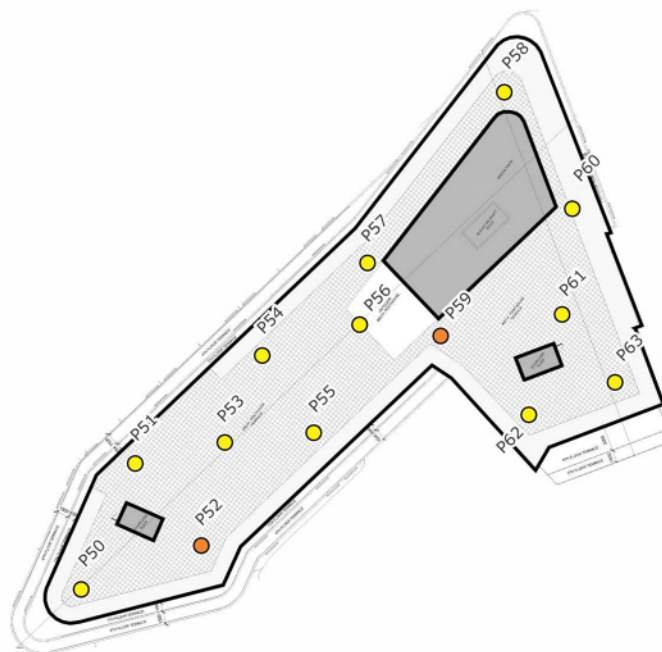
1e: Wind Tunnel Results – Proposed Scenario – Annual – Roof Level Plan
